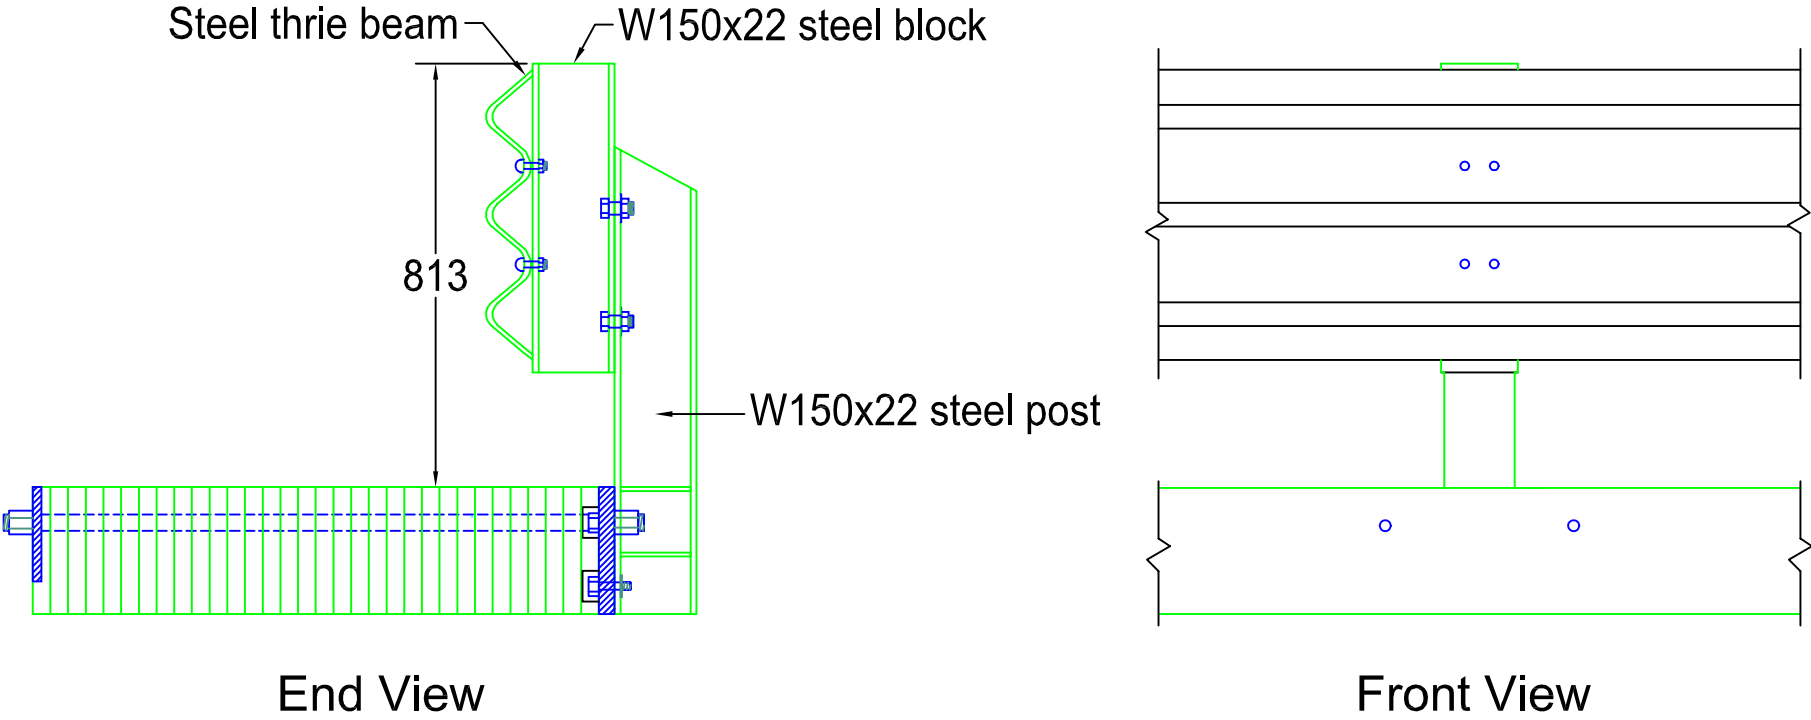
Steel System, Thrie Beam on Steel Posts (102,103).
